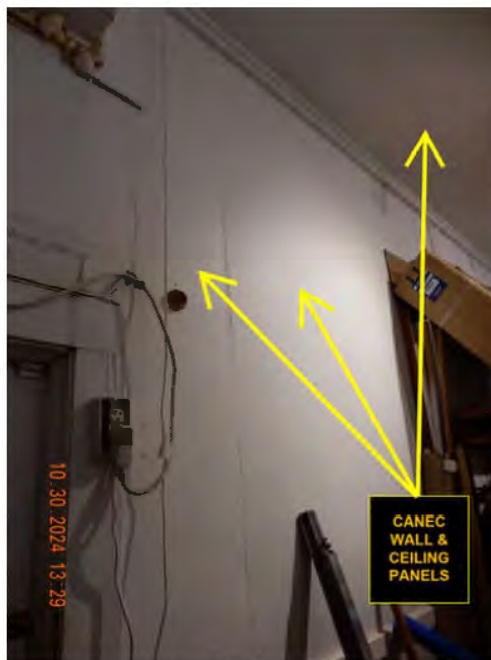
& 56. Canec wall & ceiling panels (DSCN4038 & DSCN4058).
